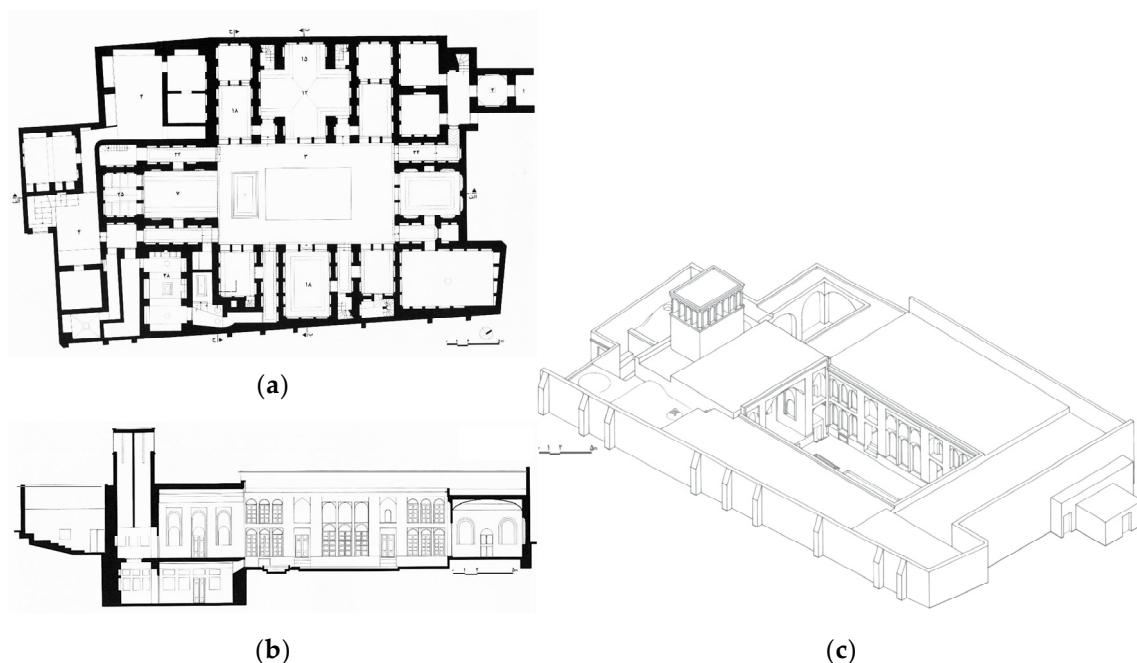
Tehrani-ha house [47]: (a) plan view; (b) sectional elevation view; (c) perspective view.
